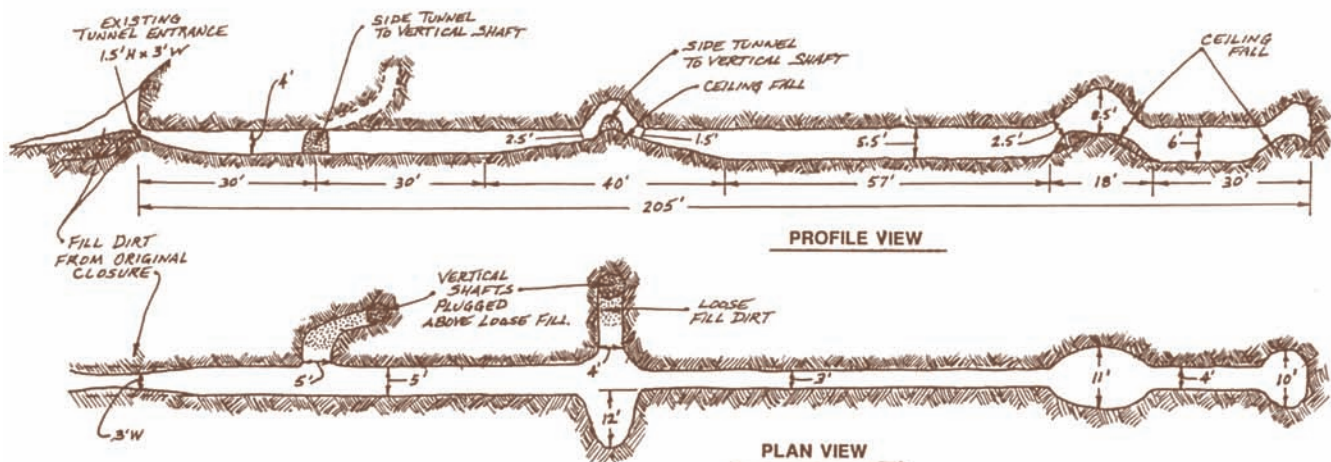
Collapsed tunnels and narrow openings are two potential hazards of studying mining sites. Blankets Creek Gold Mine (Site 9CK465), Cherokee County (Source: Allatoona Lake Managers Office 1996).
